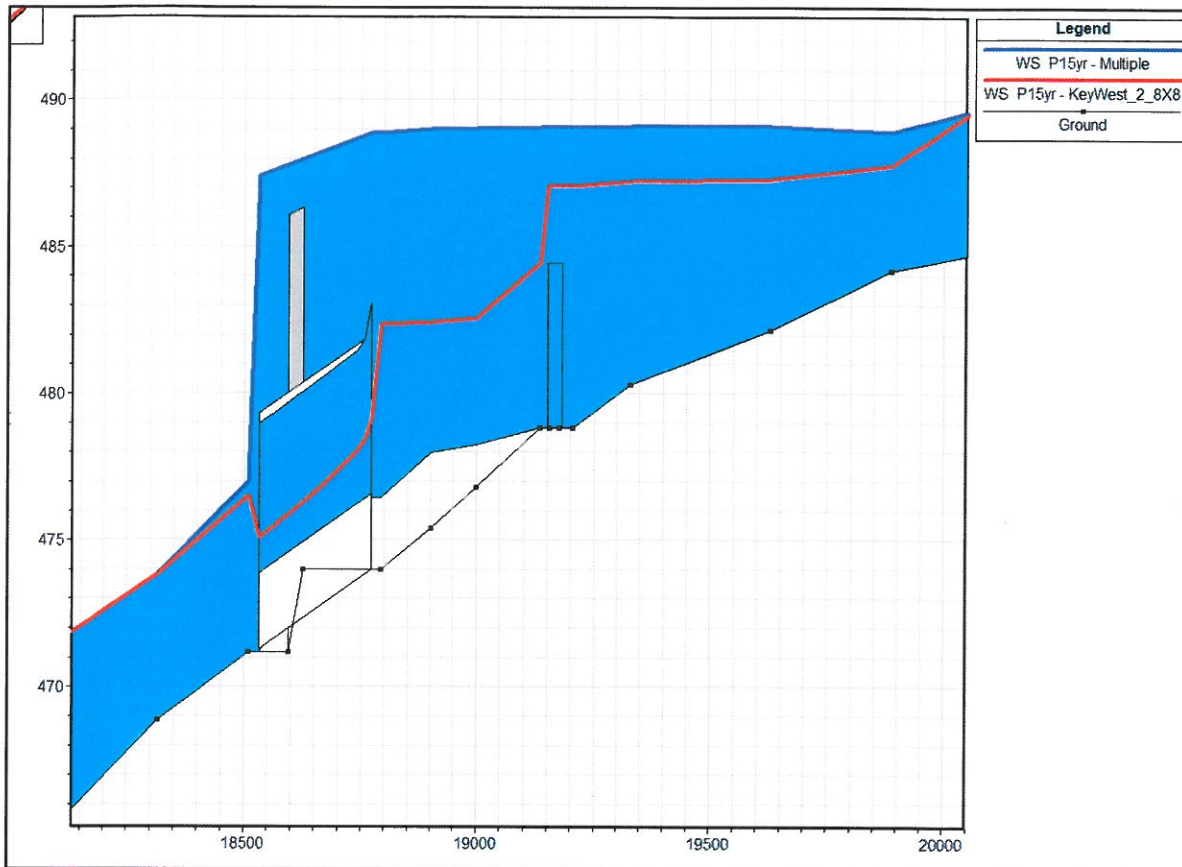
Blue Line - existing conditions design storm water surface elevation. Red Line – Alternative 1 design storm water surface elevations.
